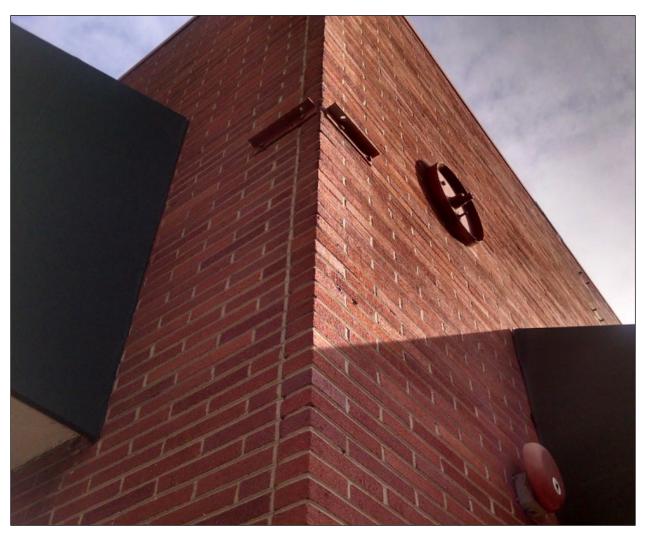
Articulation of Roman brick masonry walls at the corner of Chorro Street and Marsh Street, with brackets that formerly held the vertical Rileys sign and flagpole, camera facing north (SWCA, May 5, 2019).
